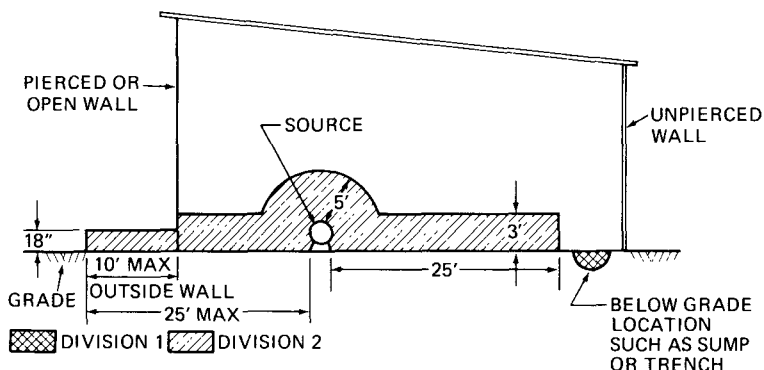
(c). Pumps and similar devices handling flammable liquids at moderate pressures, indoors with adequate ventilation and with a pierced wall or full wall opening.
